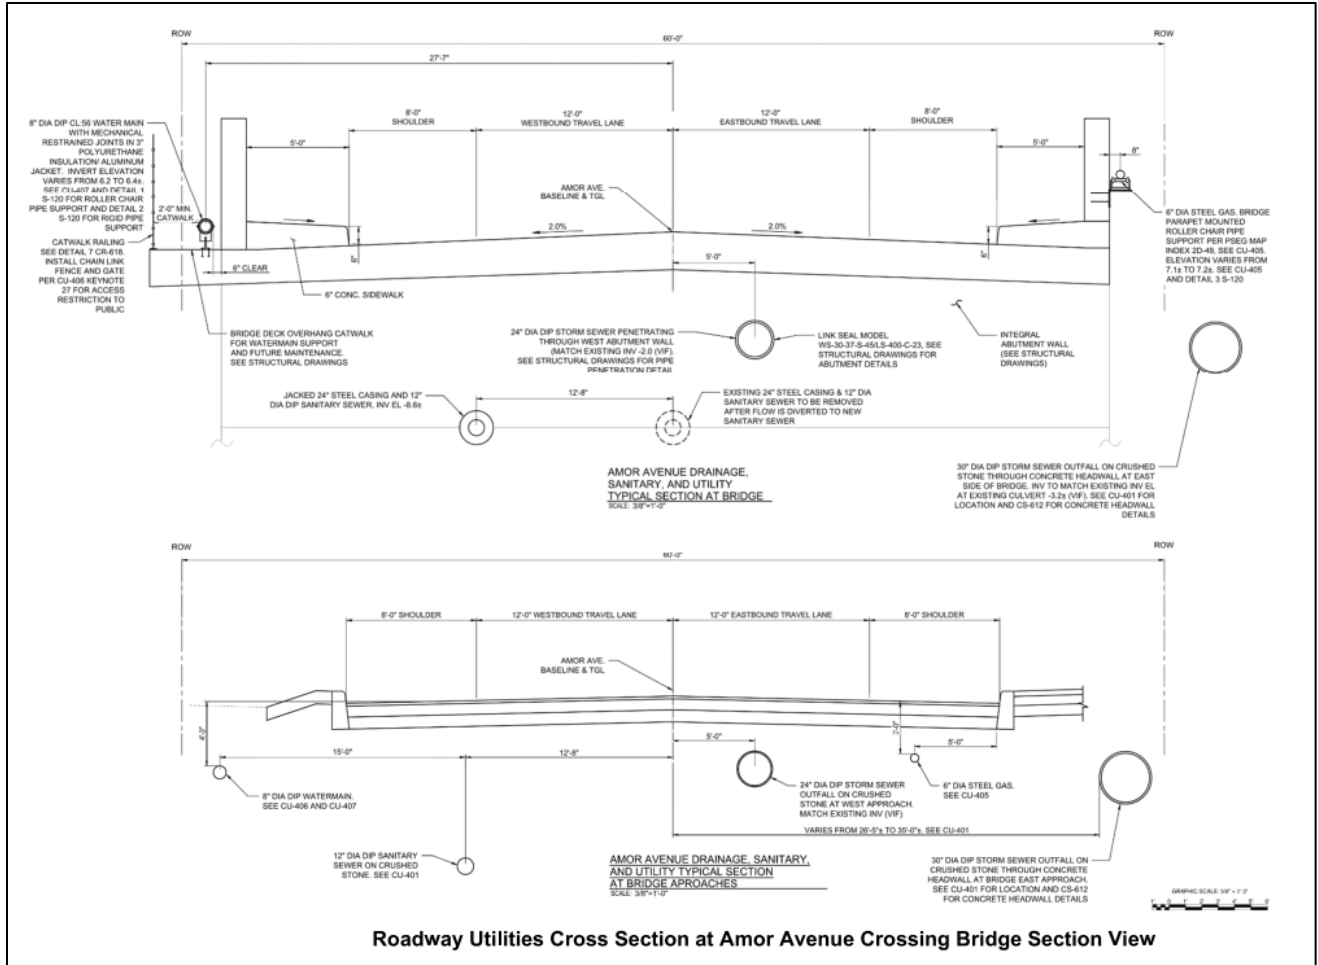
Roadway Utilities Cross Section at Amor Avenue Crossing Bridge Section View
